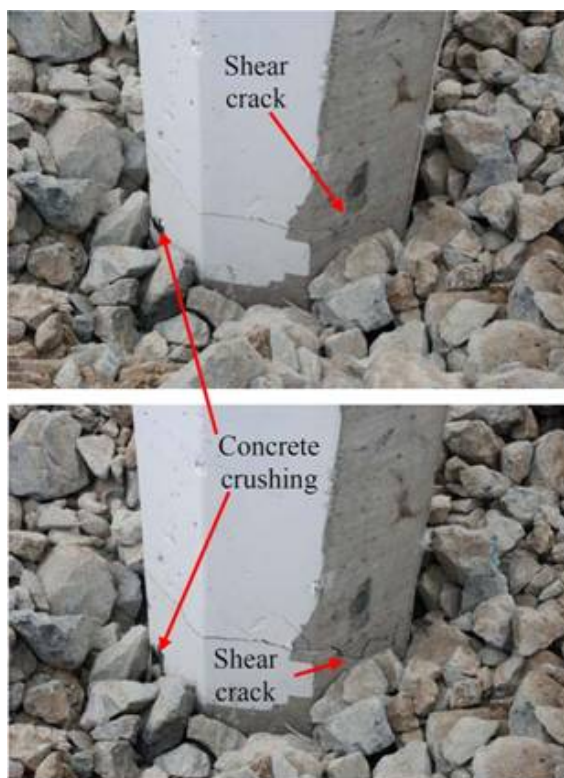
Details of the observed damage (Single Pile Test 2)
